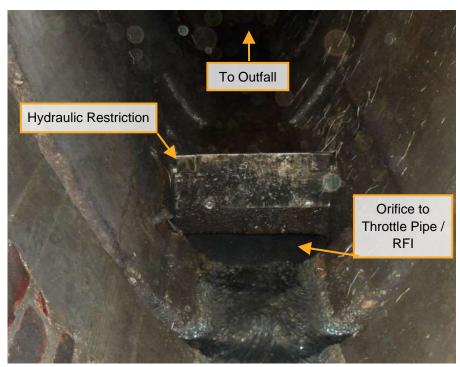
| Water Regulator, Facing Downstream Toward Outfall
